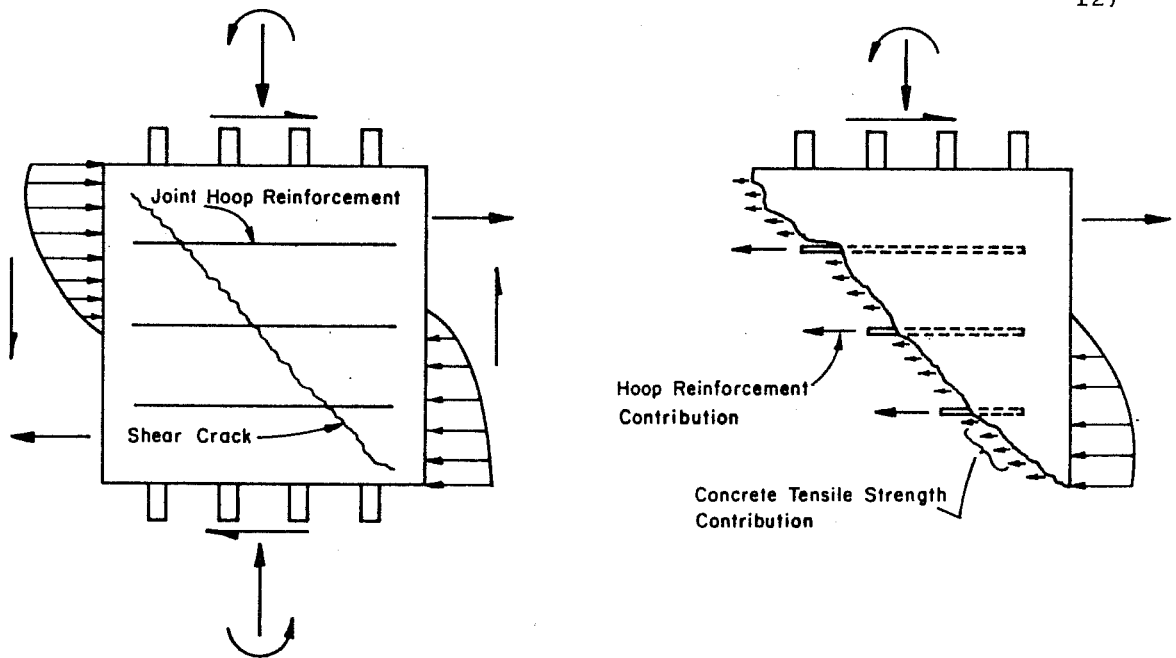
Joint hoop reinforcement considered the same as beam stirrup reinforcement
